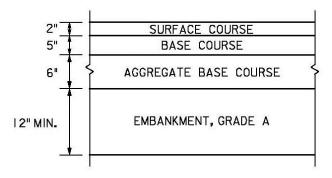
12: TURNPIKE PAVEMENT SECTION (MAINLINE, RAMP & SHOULDERS)
